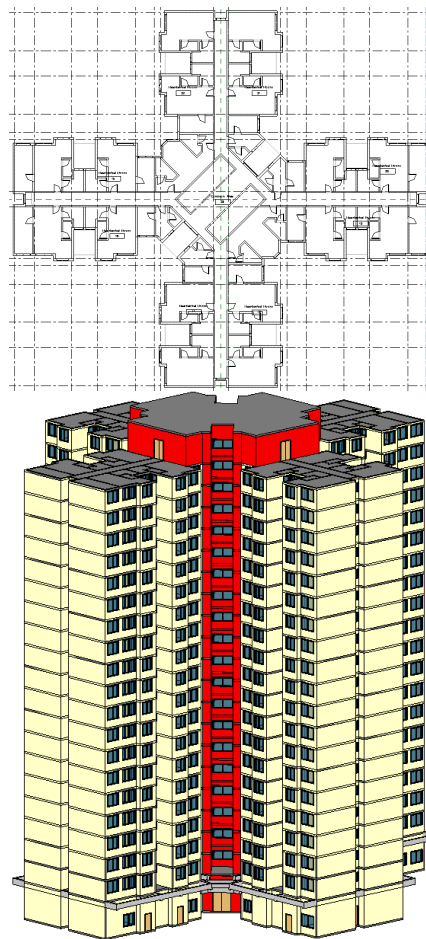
3D building information modeling (BIM) model and its floor layout.
